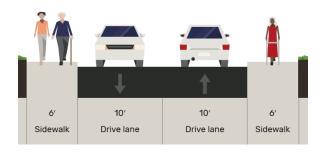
C: ACCEPTABLE LOCAL STREET TYPICAL CROSS-SECTION - SHARED STREET (SOURCE: STREETMIX)
